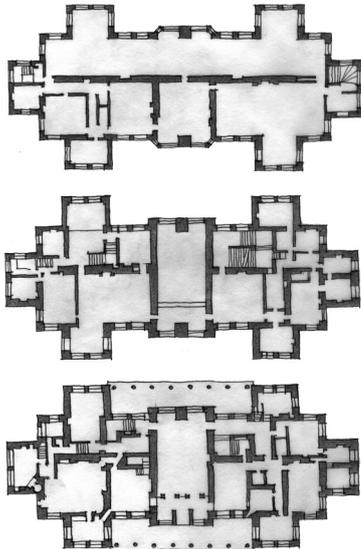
Robert Smythson, Hardwick Hall, Plans. Author
